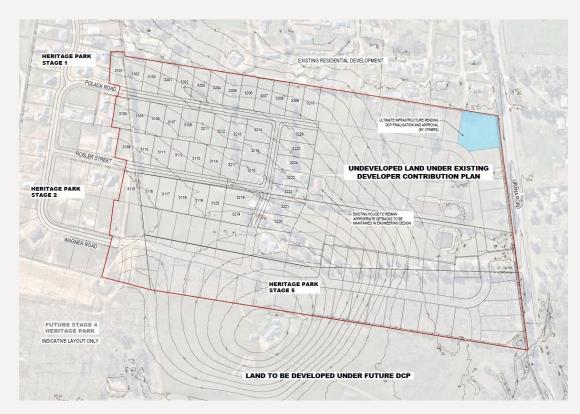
Proposed subdivision layout plan (aerial overlay)
